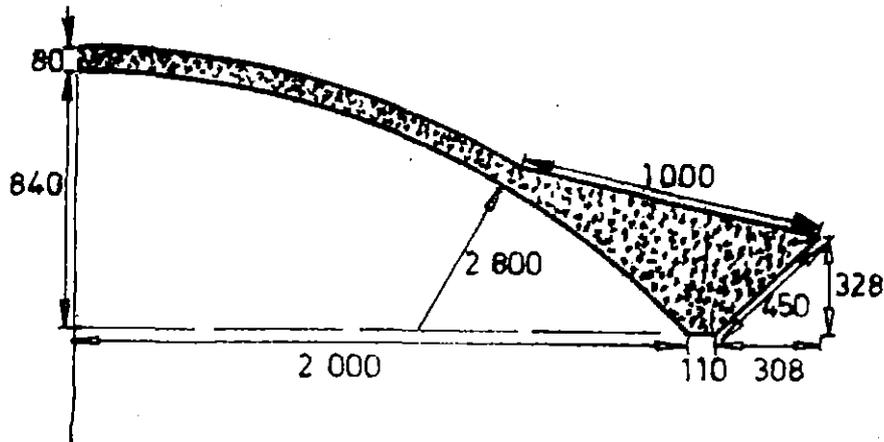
Alternative Design of Collar for Use with Poor Soils
